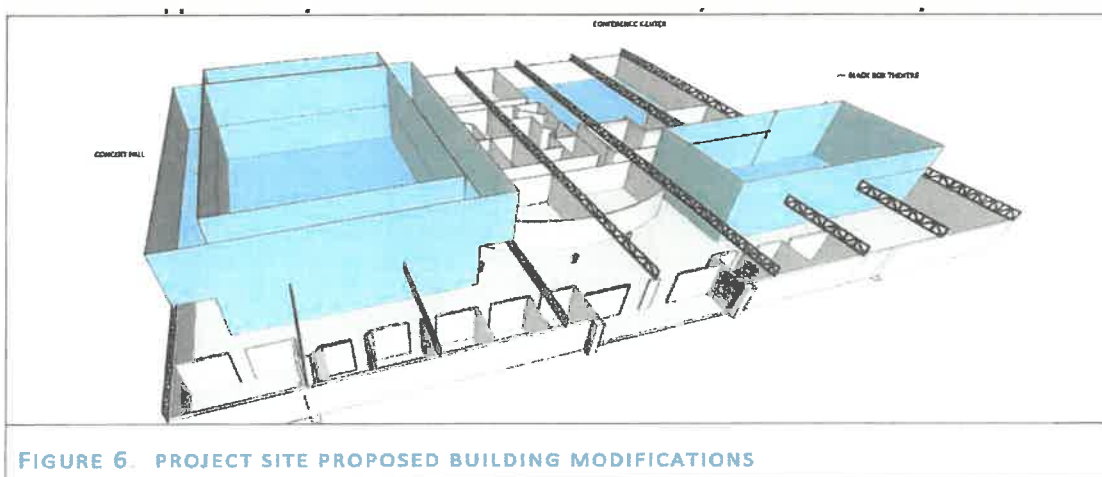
PROJECT SITE PROPOSED BUILDING MODIFICATIONS
